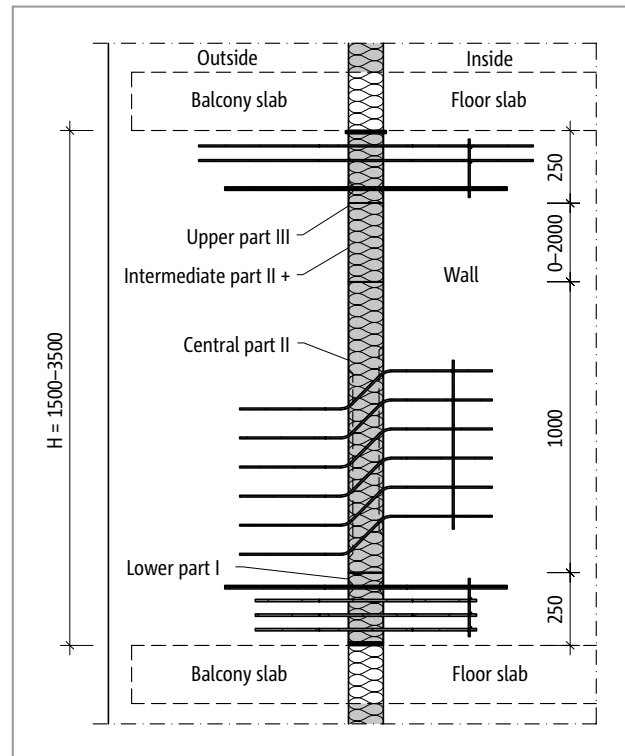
Schöck Isokorb® XT type W: Balcony construction with thermally insulated load-bearing shear walls
